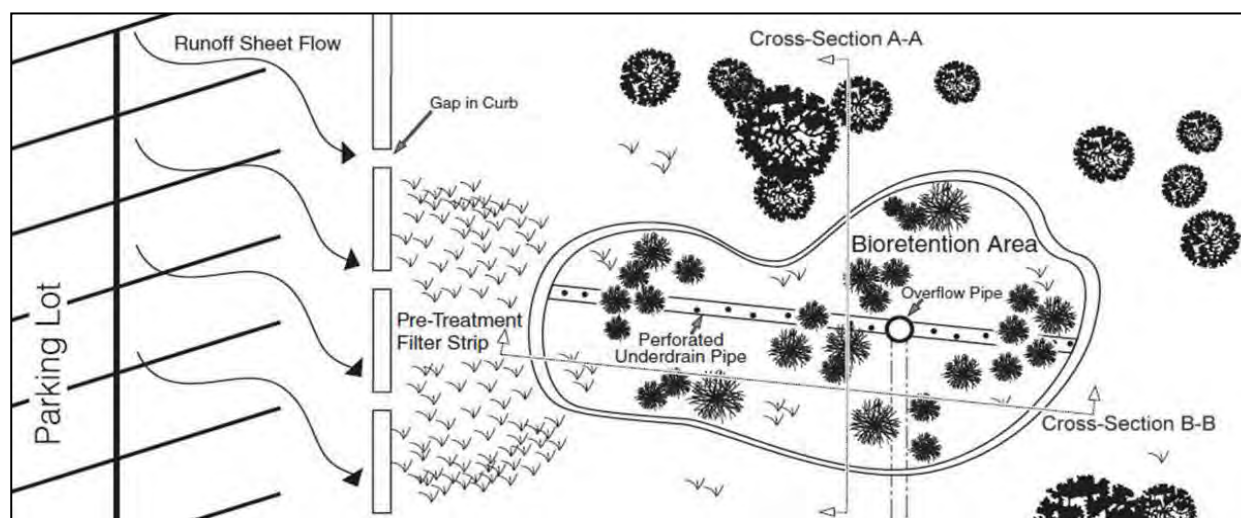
Concept Plan of a Bio-retention Area (Rain Garden)
